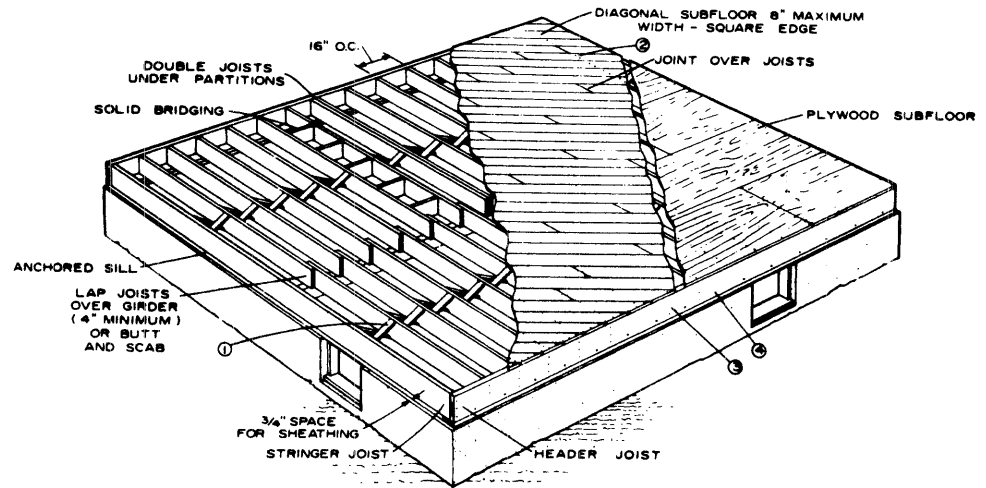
Floor framing for platform frame construction. (U.S. Department of Agriculture)
